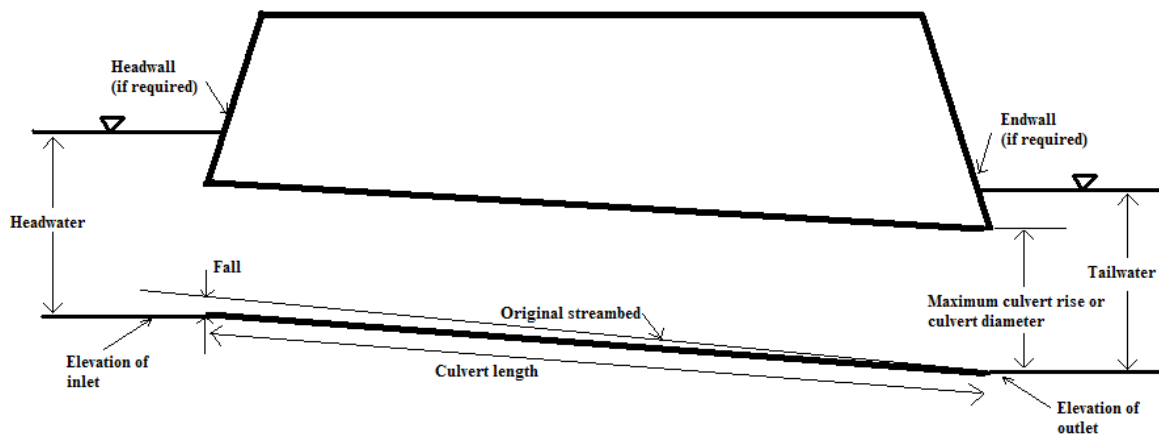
Some culvert dimensions and parameters required for GDOT culvert design. For descriptions of these and other parameters see Section 2.4. Although headwater and tailwater elevations are shown here above the culvert rise or diameter, during most flows they will be below the maximum culvert rise or diameter.
